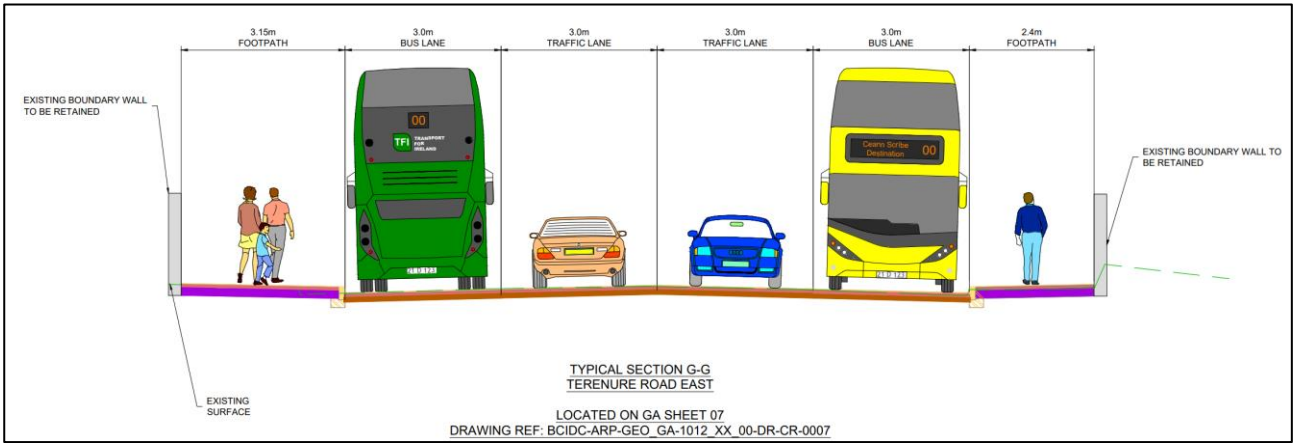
Typical Cross-Section adjacent to 60 Terenure Road East
